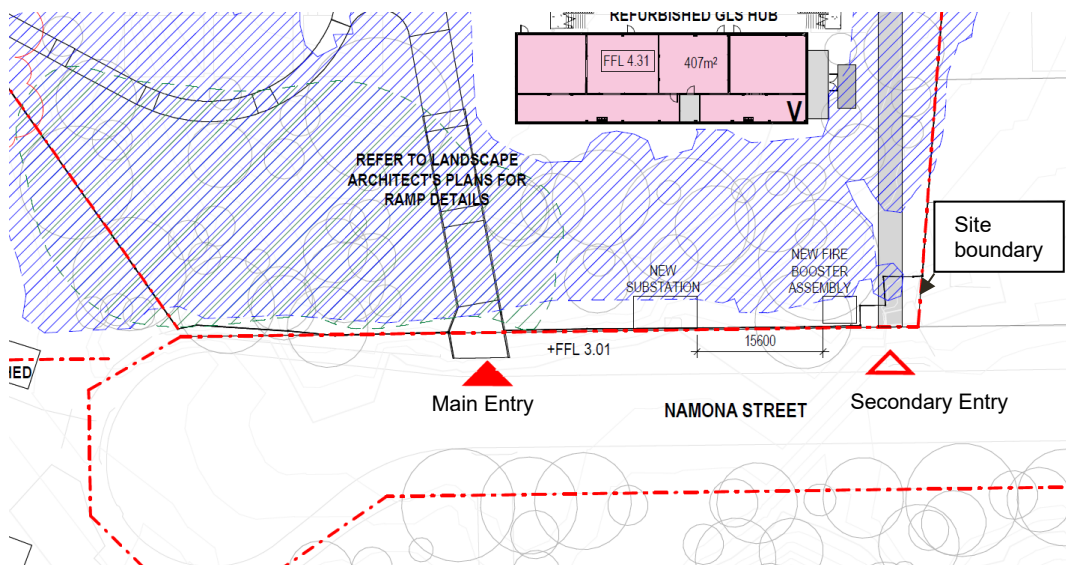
Fire Hydrant and Electrical Substation location (Source DesignInc) NTS
